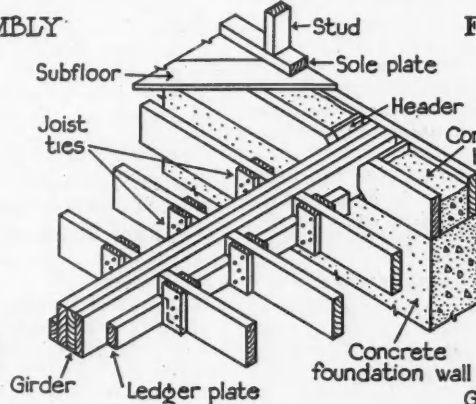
FRAMING JOIST NOTCHED OVER LEDGER STRIP
